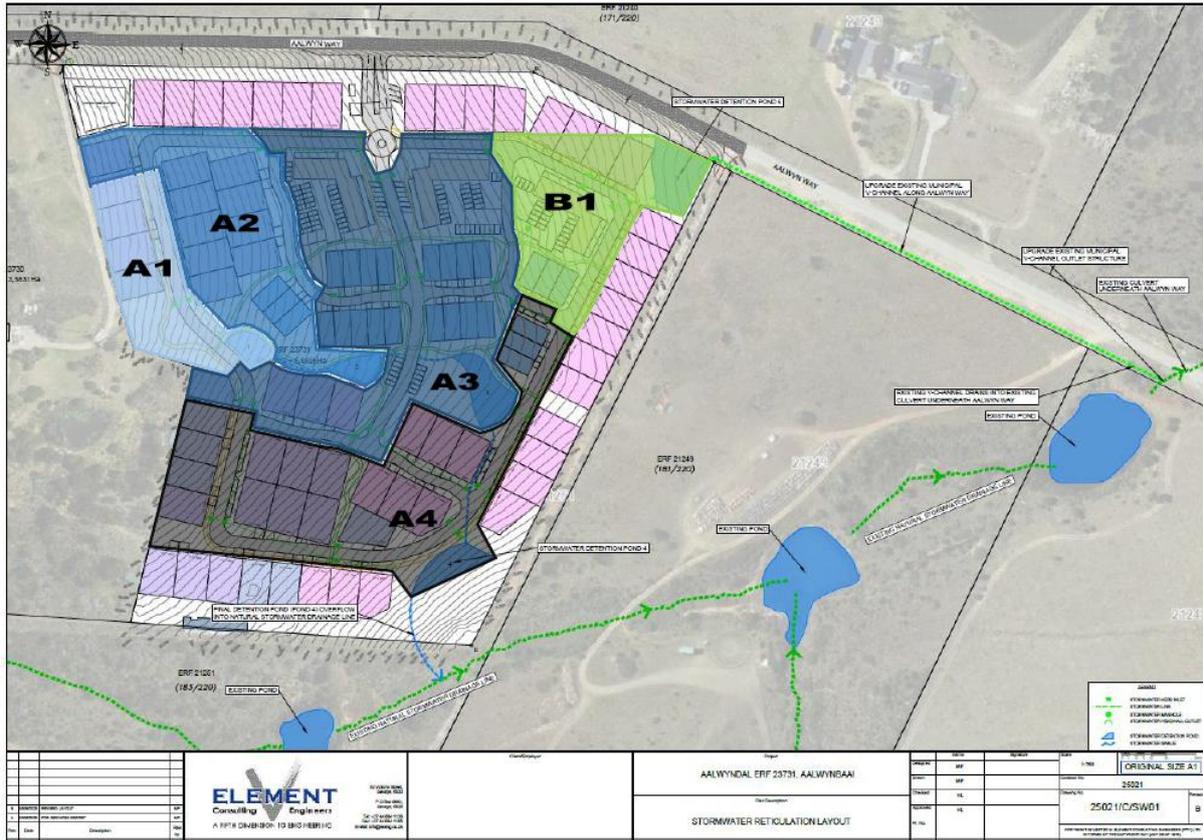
Proposed internal drainage zones and stormwater layout (Element, 2025).
